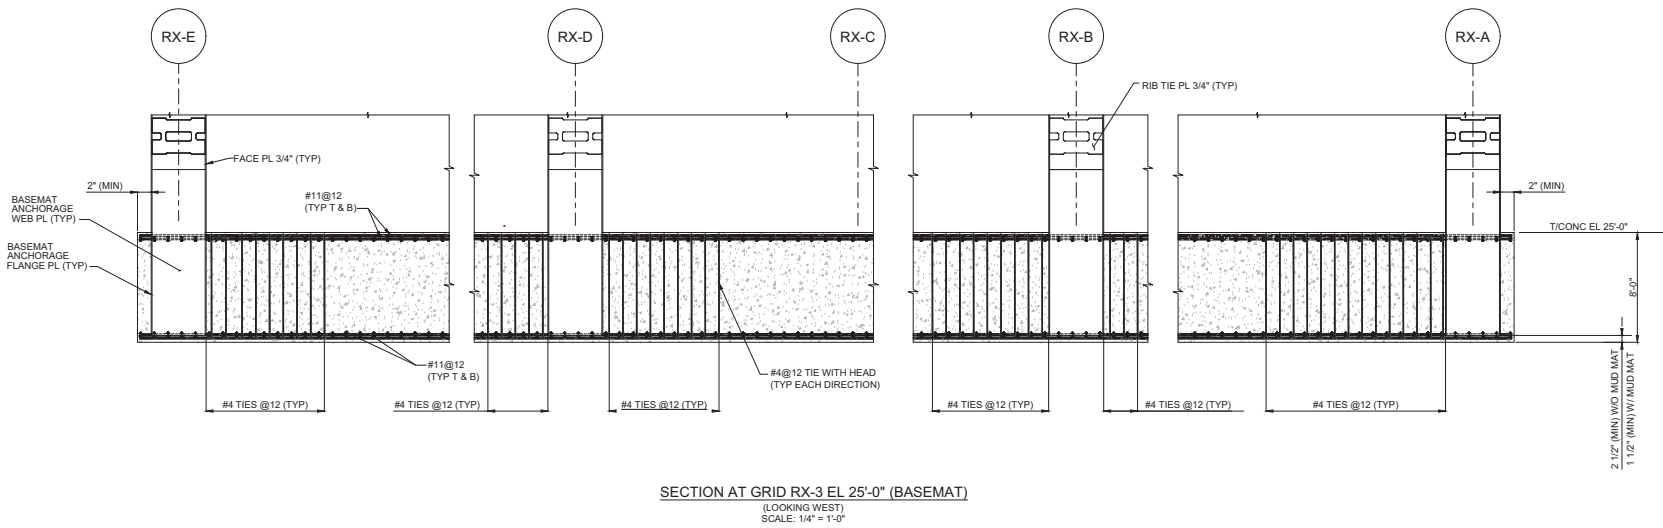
Typical Reinforcement Layout of Reactor Building Basemat
